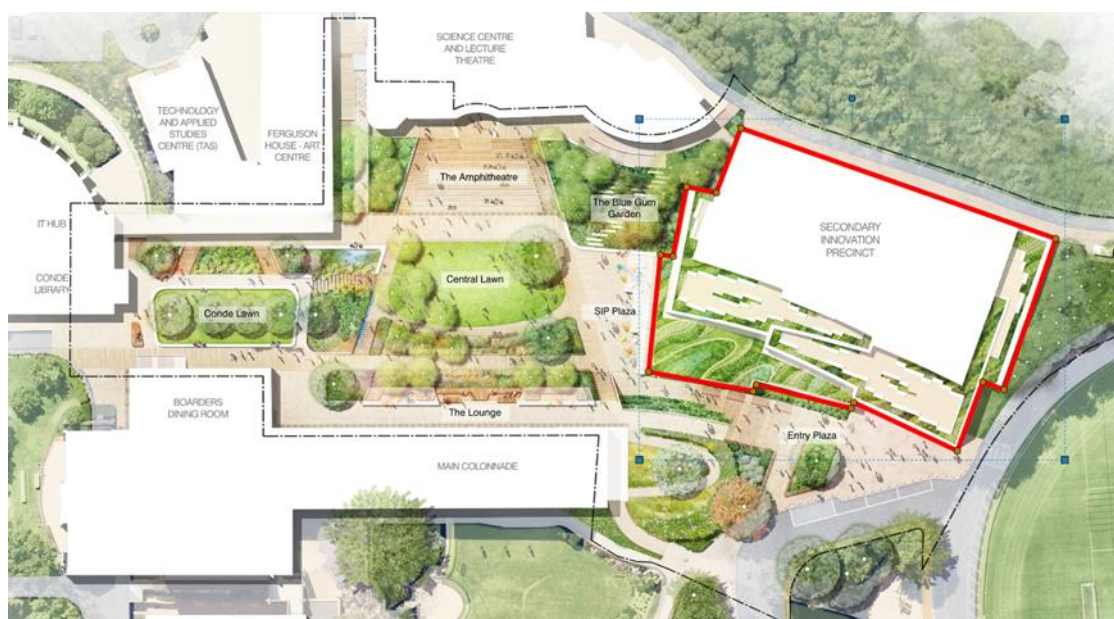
Site plan (Source: TCL) – Campus Common with SIP building shown highlighted in red.
